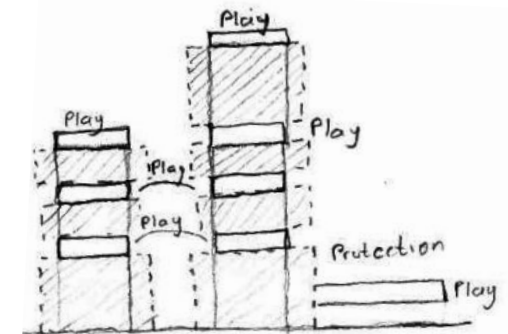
Apartment Configuration and Layout Effect on Building Envelope
